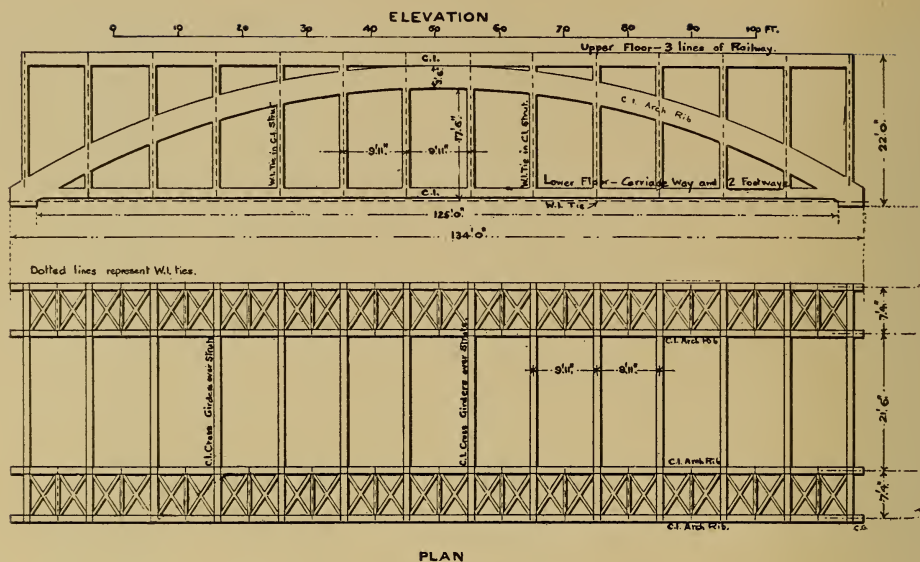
GIRDER OF HIGH-LEVEL BRIDGE, NEWCASTLE-ON-TYNE. ERECTED 1849.
